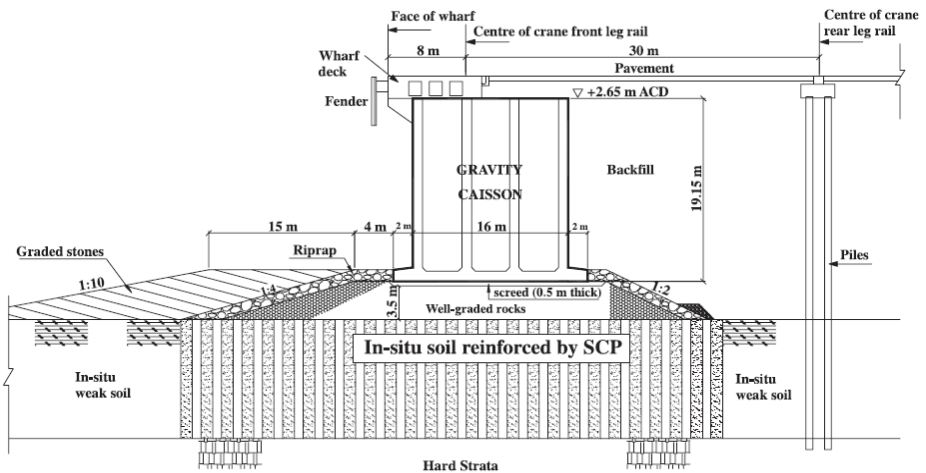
Typical section of gravity caisson wharf founding on sand compaction piles (after Leung & Shen, 2008)
